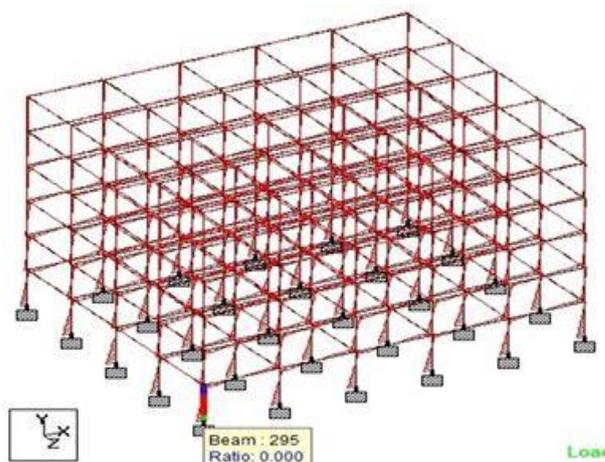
STAAD.PRO Model Showing Beam Number 295
